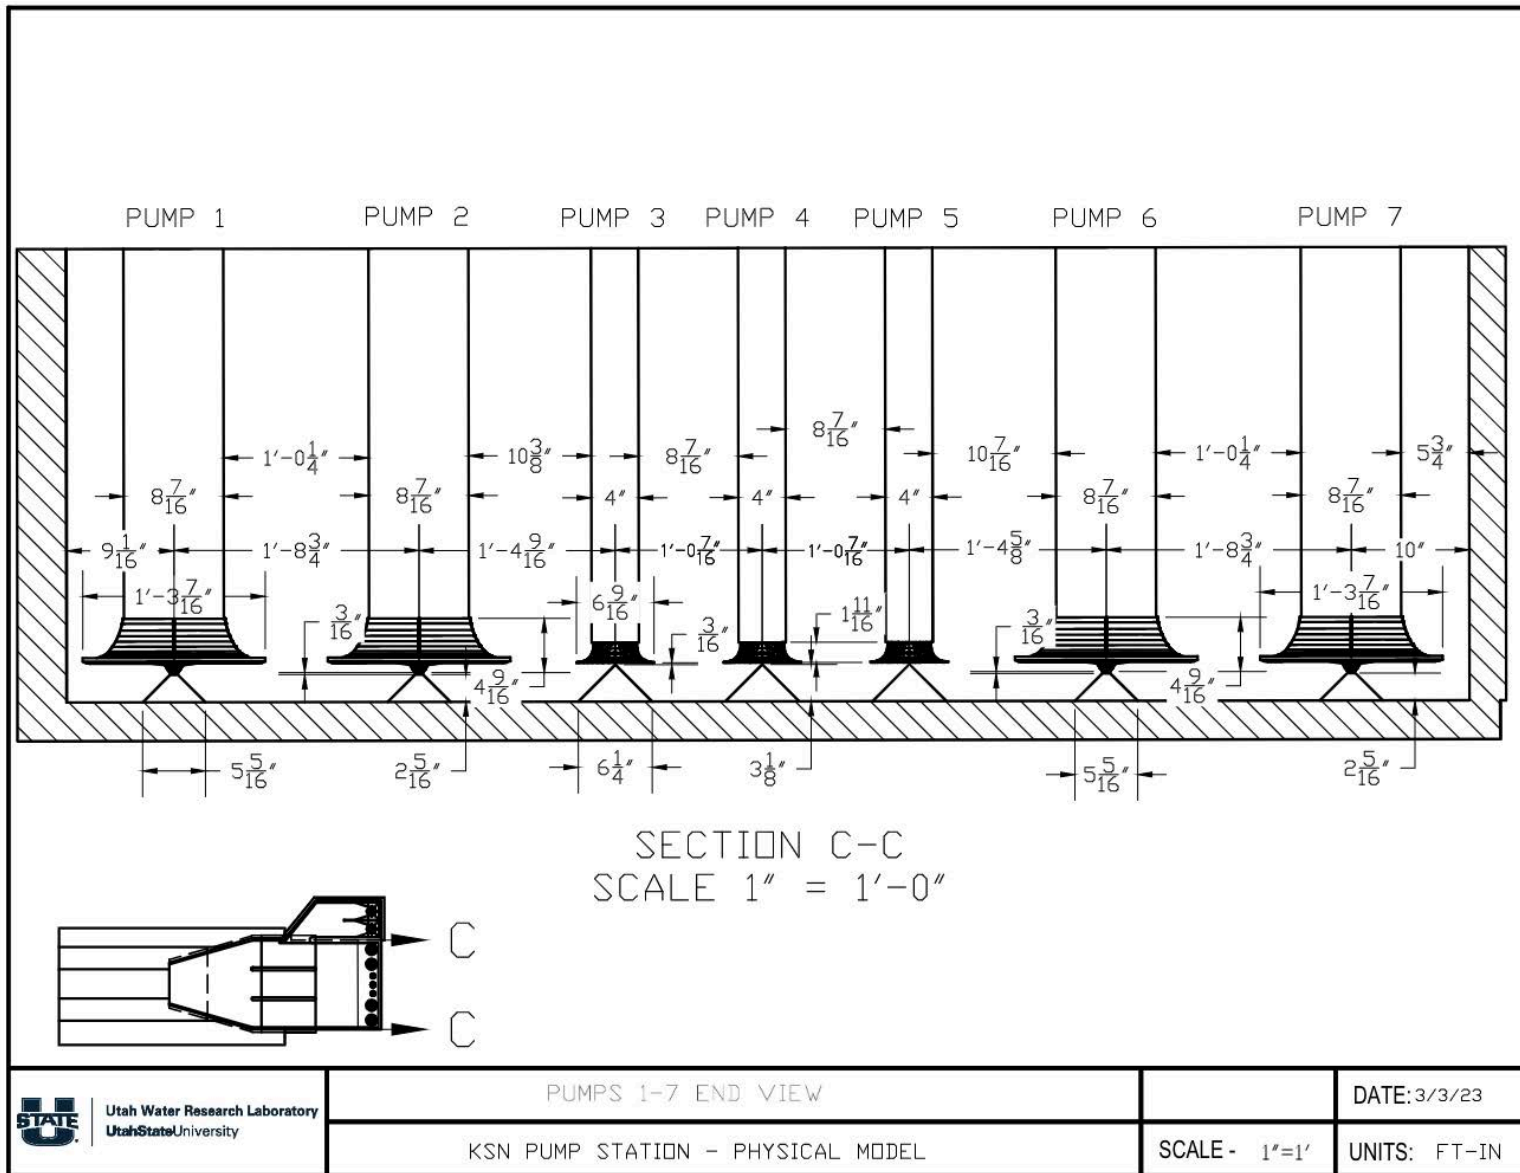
Final fix configuration for pumps 1 through 7 (end view model dimensions)
